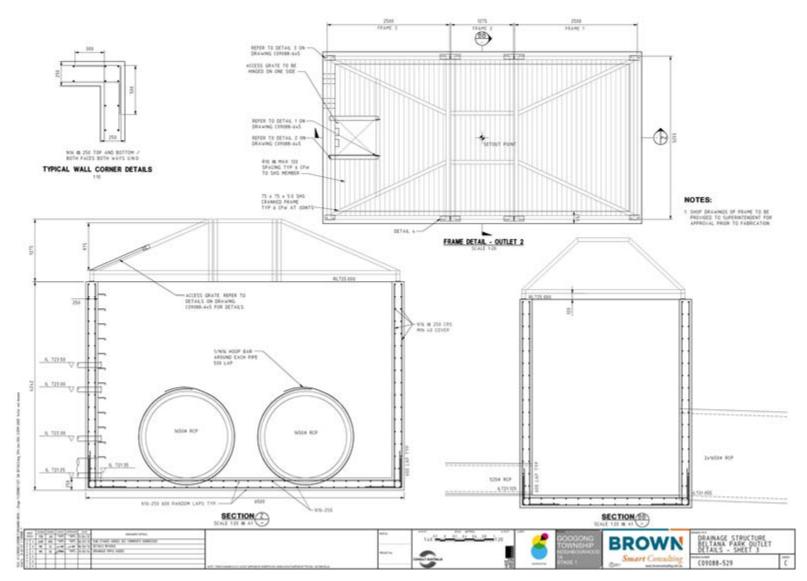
Design drawings - Drainage structure Beltana Park outlet (Sheet 3)
